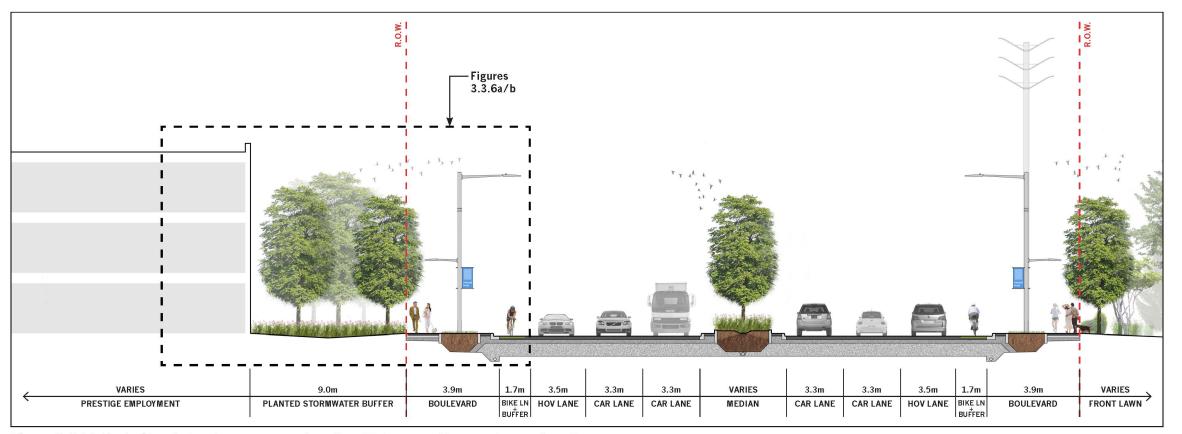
Keele Street streetscape concept section [Future prestige employment use].
